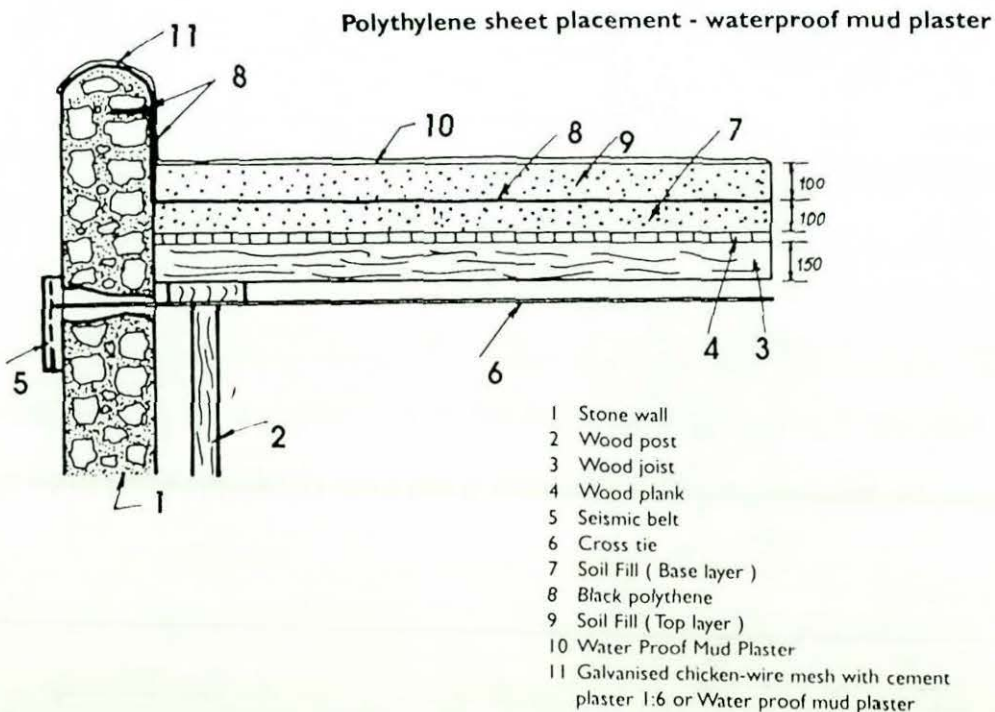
Roof treatment to reduce weight of soil and to provide protection against water penetration
